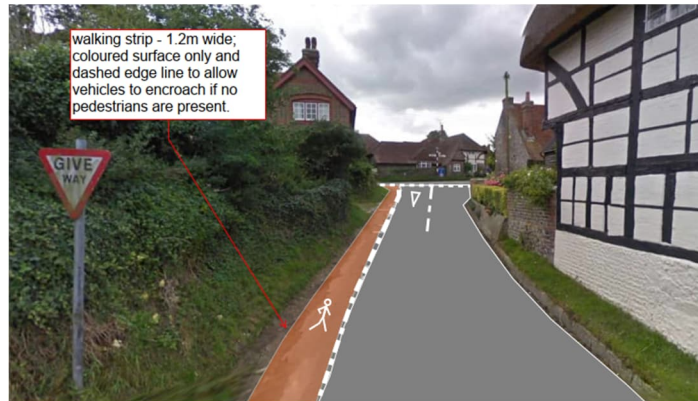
Photomontage showing the proposed footway in Houghton Lane looking north
